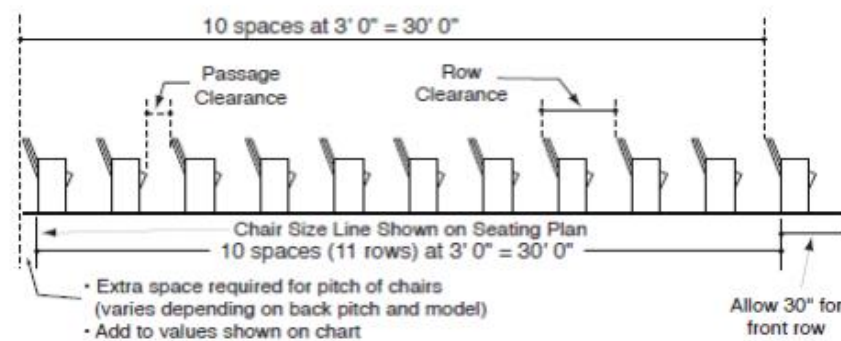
14. Chair arrangement in a classroom (Washington University, 2015)
